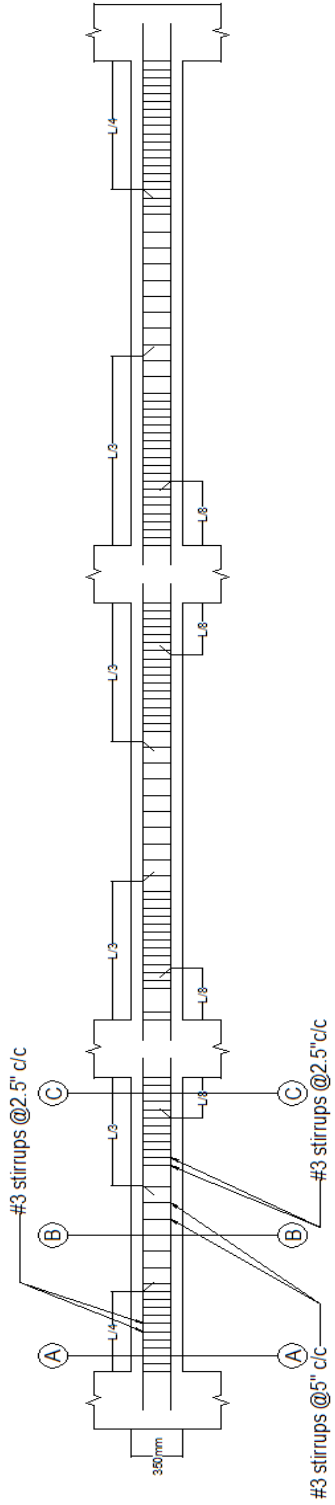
Beam rod detailing X-axis GF-4F
